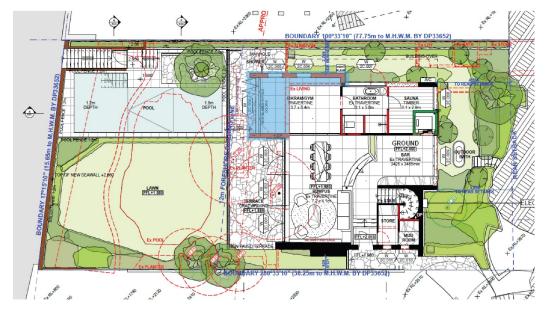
The proposed extension beneath the master bedroom on the ground floor (shaded blue) is not approved.
